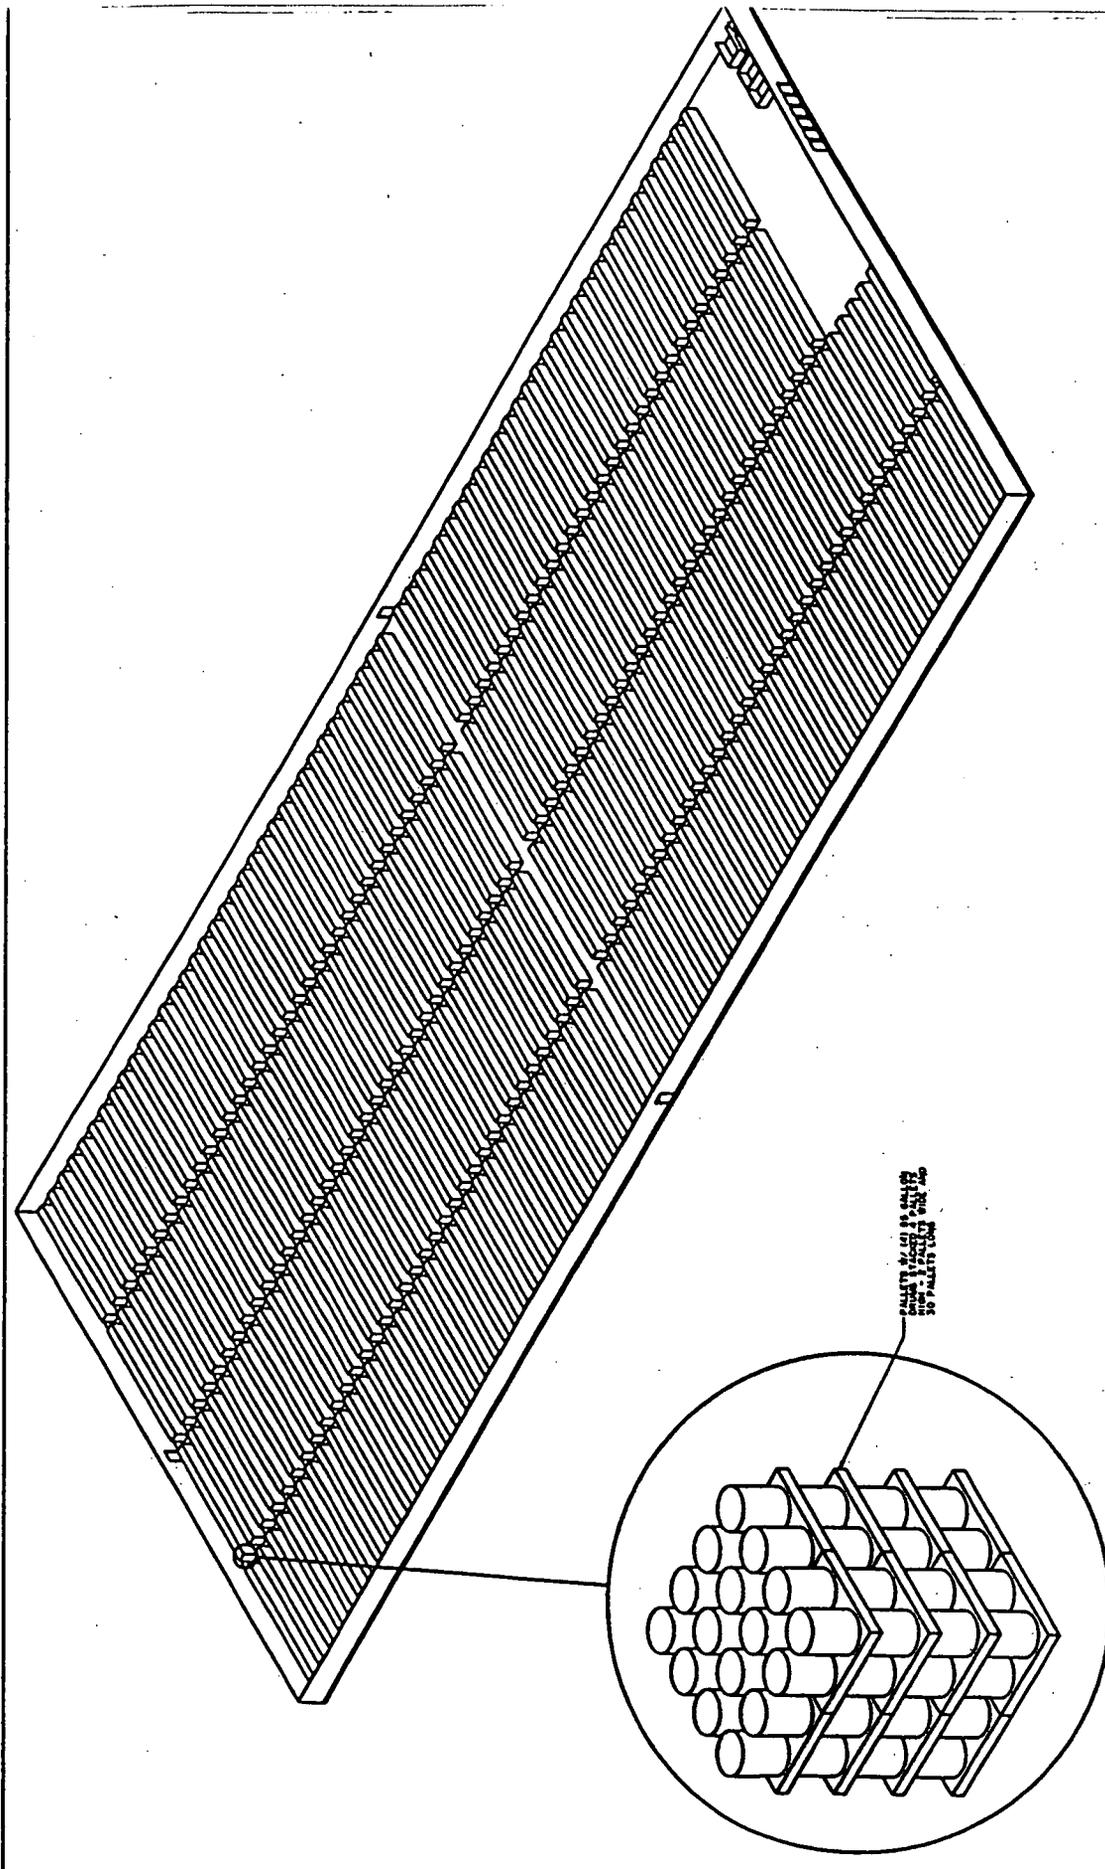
Conceptual Layout for New LLW/LLMW Storage Facility
